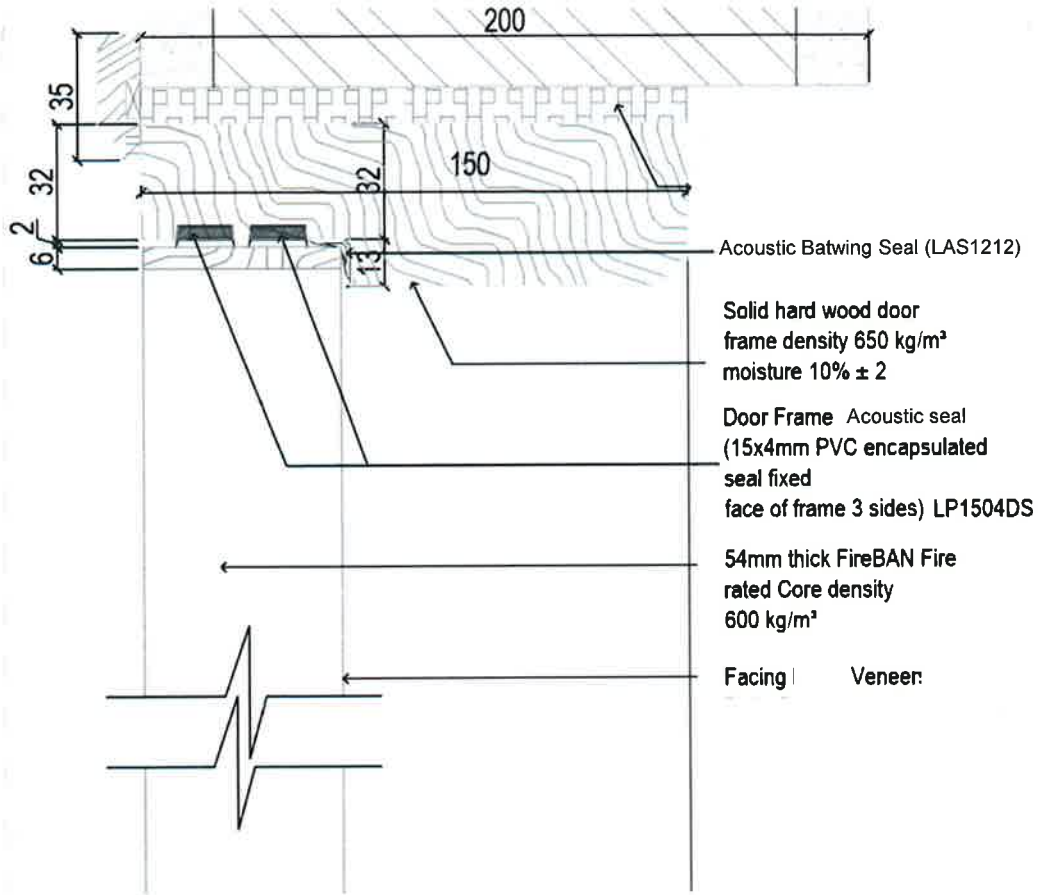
Side view of top section fixing details of FD60 door frame and leaf
